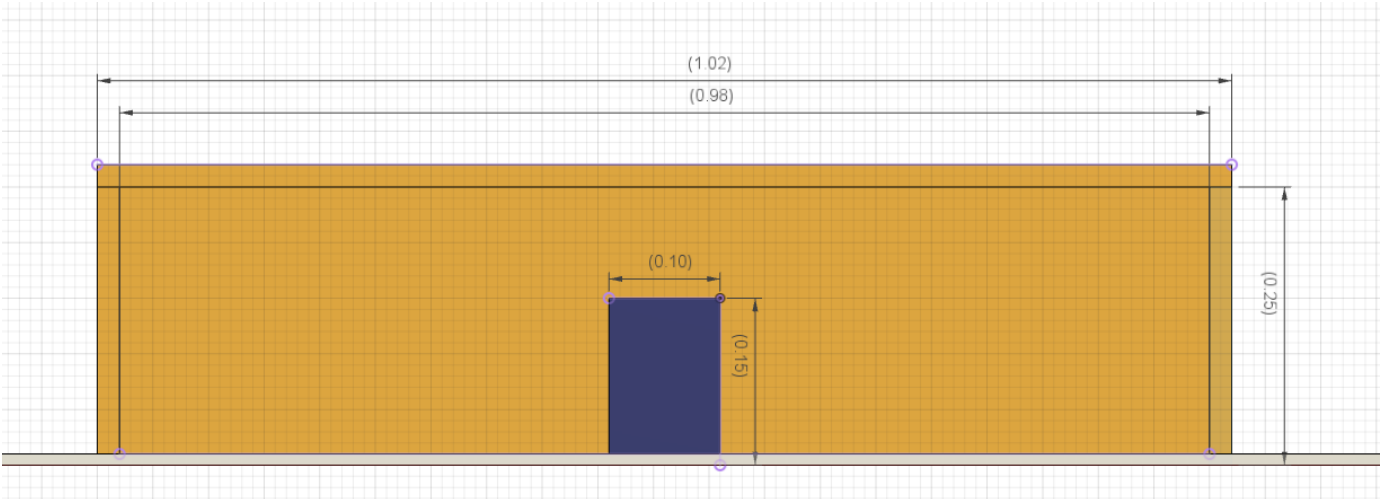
Front view of Castle and Dimensions (scale 1: 1m)
